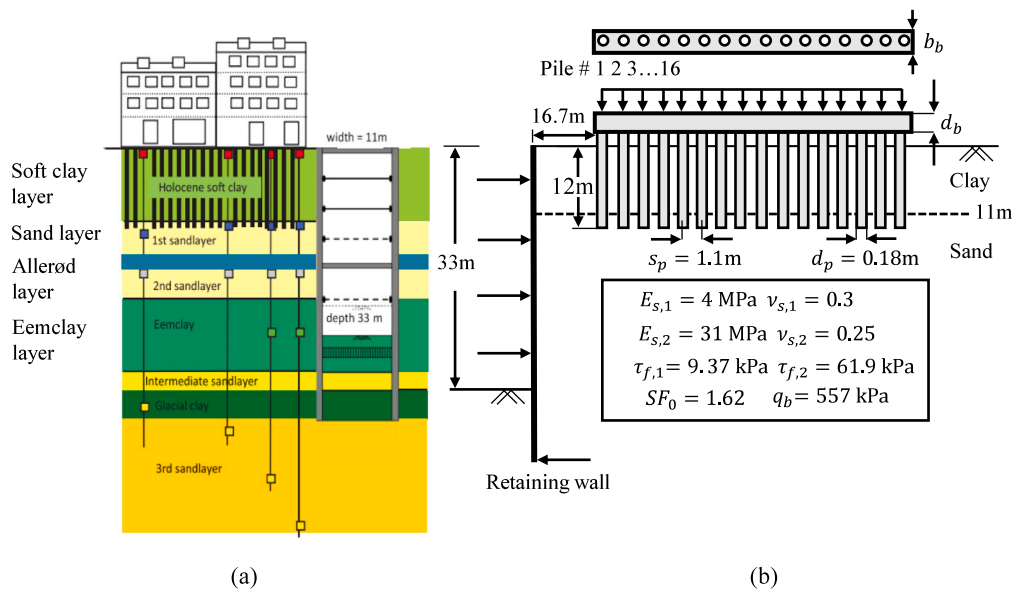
(a) Cross section of Ceintuurbaan Station with soil profile (Korff et al., 2016); (b) Schematic illustration of building adjacent to excavation in Amsterdam.
